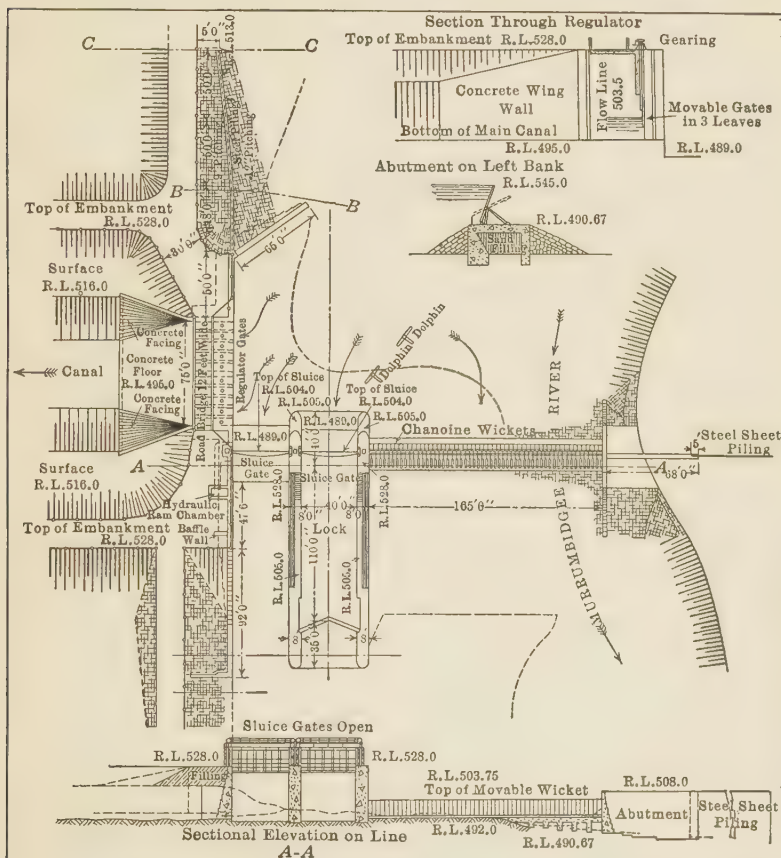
Murrumbidgee diversion works. New South Wales, Australia.
